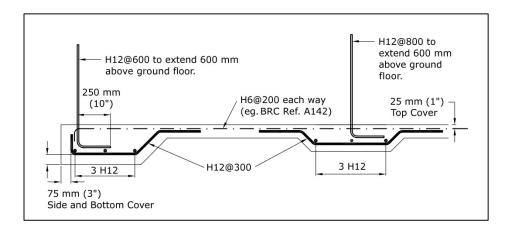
Rebar layout of slab-on-ground footing for masonry walls
